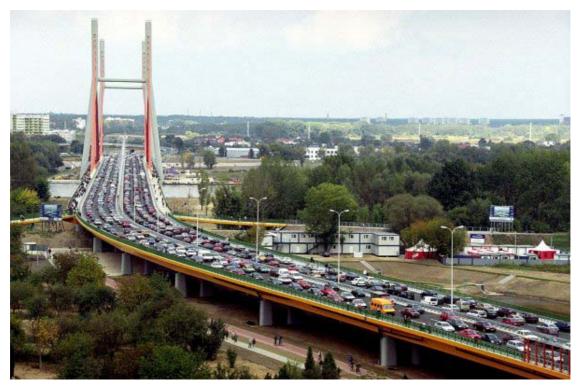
Siekierkowski Bridge over Vistula River in Warsaw
